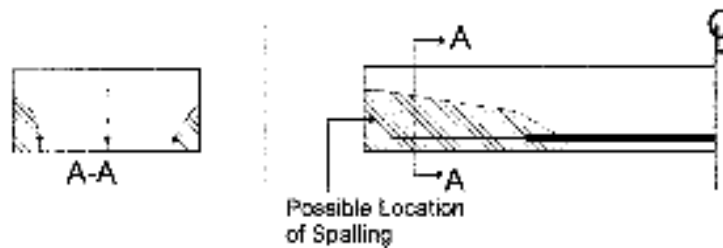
Typical damage pattern of corroded specimen (Stanish, 1999)
